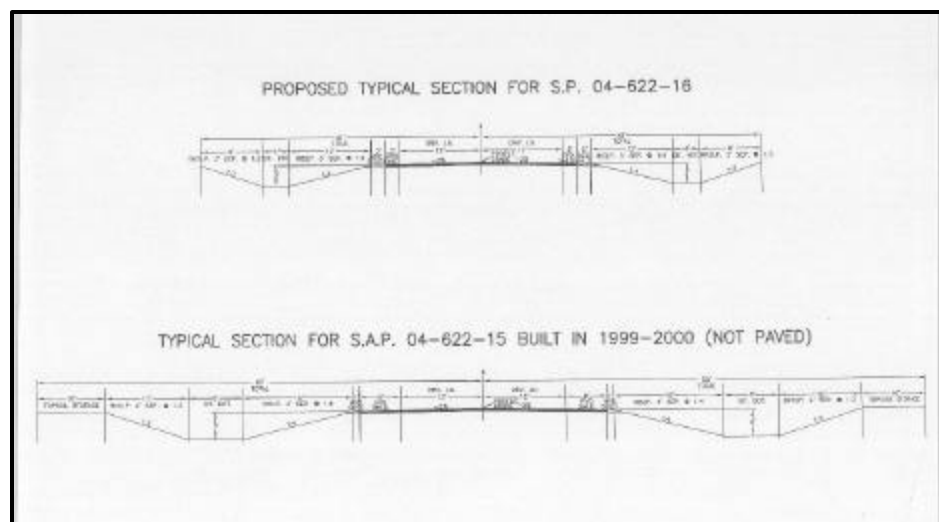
Typical Section of Proposed Alternative B Compared with Existing Improved Section of CSAH-22.
